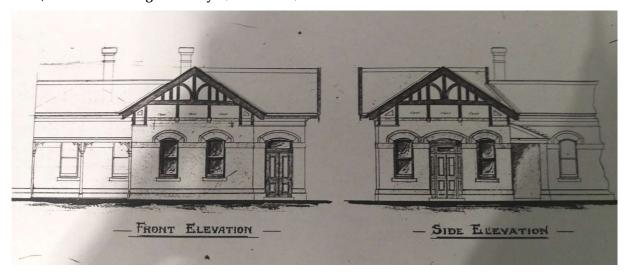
1899 drawings of the proposed new gabled-bays to Tyers and Hobson streets, with their taller roof forms (Saleta 2016).
